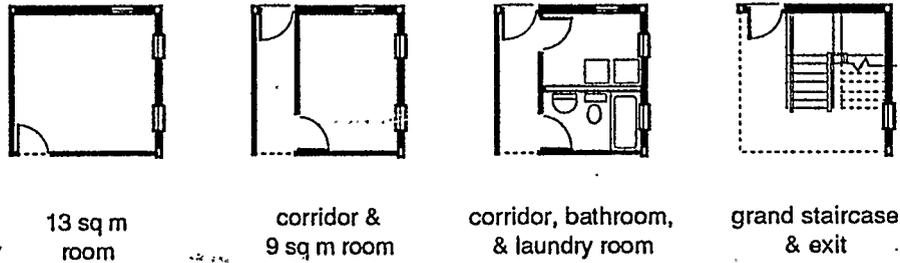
Some possible spatial arrangements within a single full sized floor panel (one module: 3.6 m or 12ft, in length and width)
